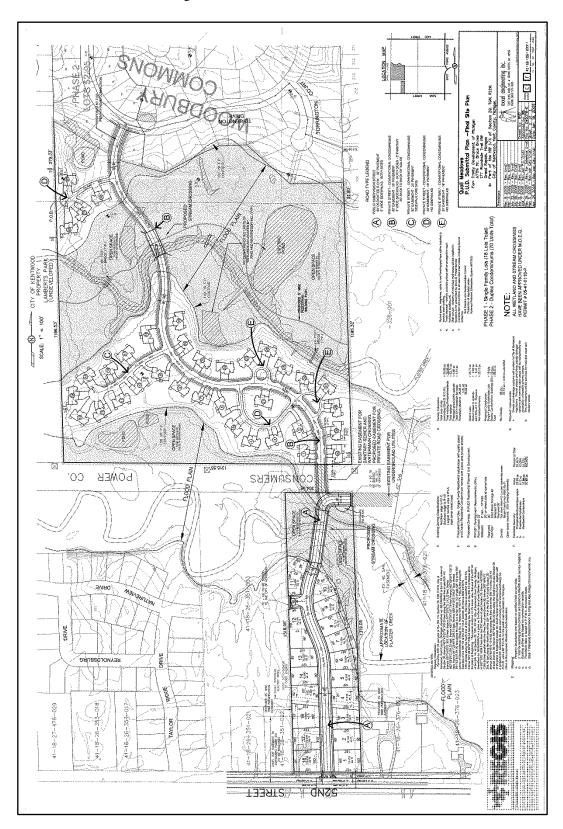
2006 Final Quail Meadows PUD Plan for Single Family Detached Lots
